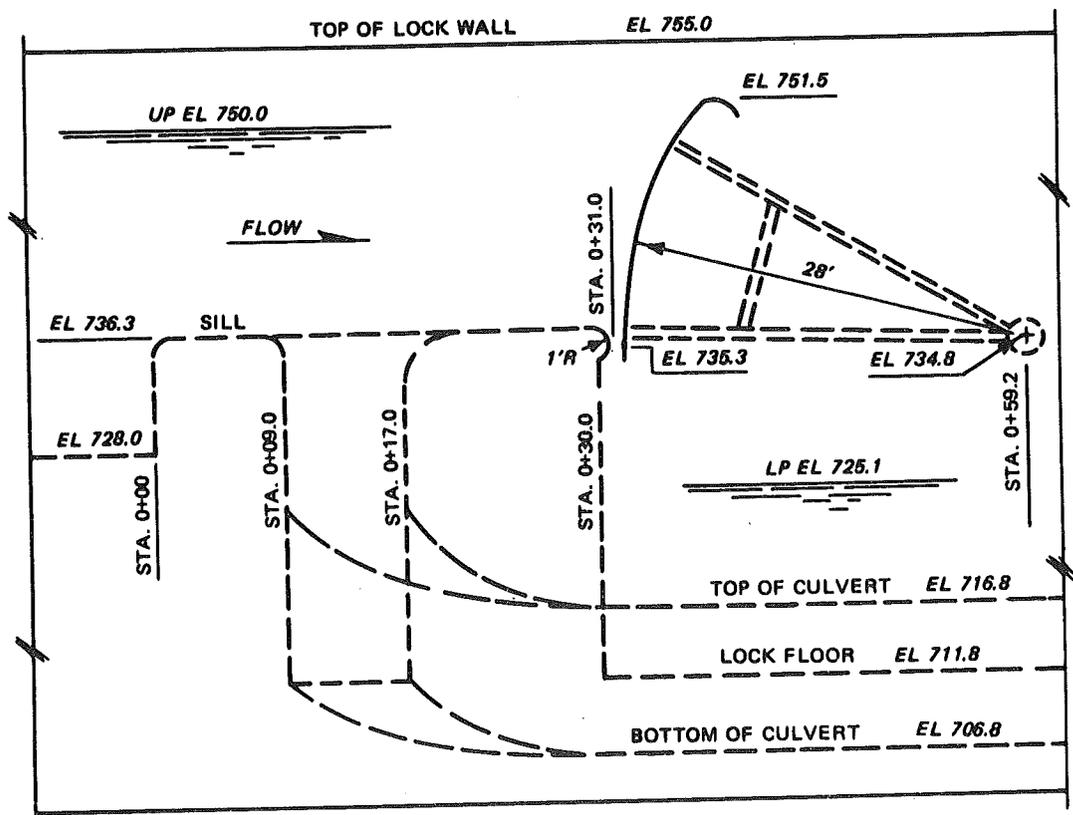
Plan of the Lower St. Anthony Falls Lock and Dam [1].
